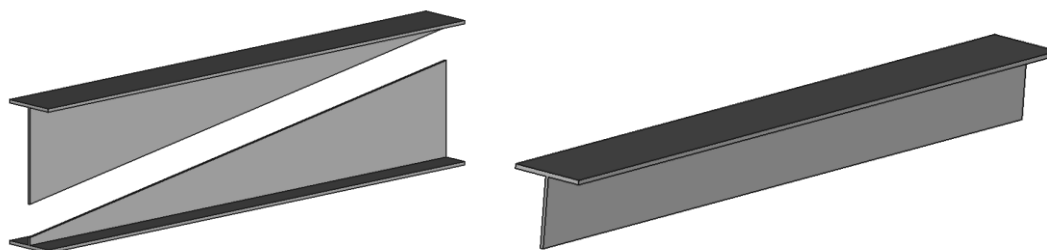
Illustration of half-IWF section and T section steel beam that used in this study
